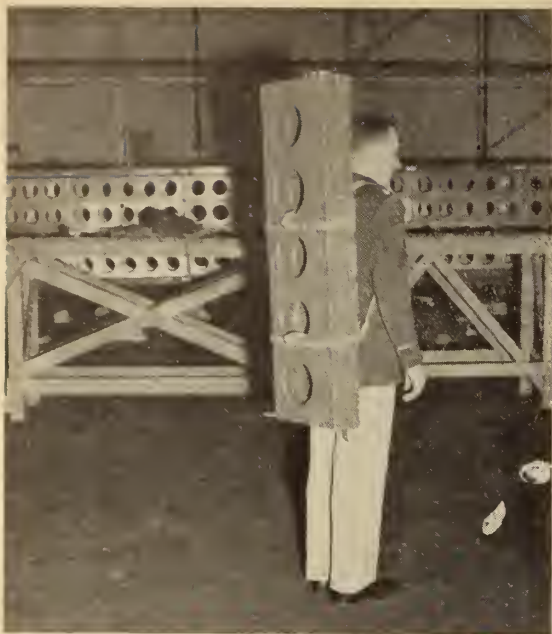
The component parts may be folded up for carrying in a pack on a man's back.
